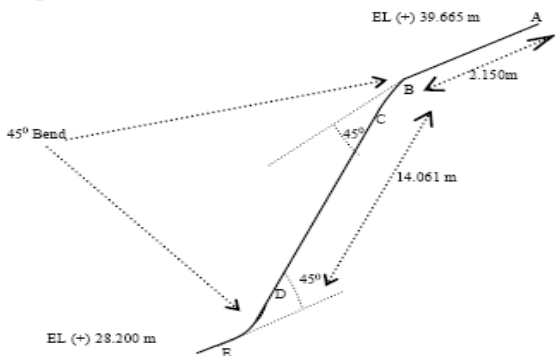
Proposed steam piping layout (left hand side) from EL (+) 39.665 meter to 28.200 meter.
